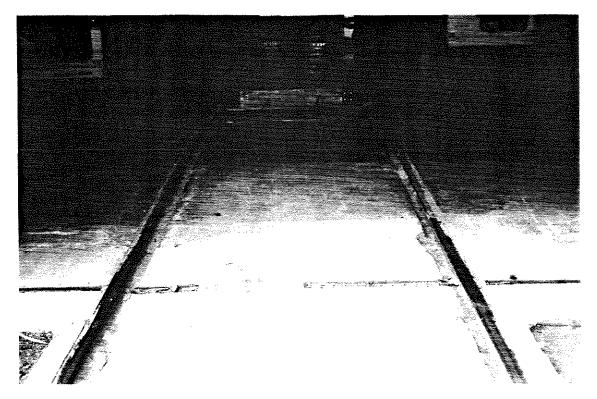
SEAD-27, 9/12/90. Close-up of the Steam Cleaning Waste Tank - Building 360, facing west.
